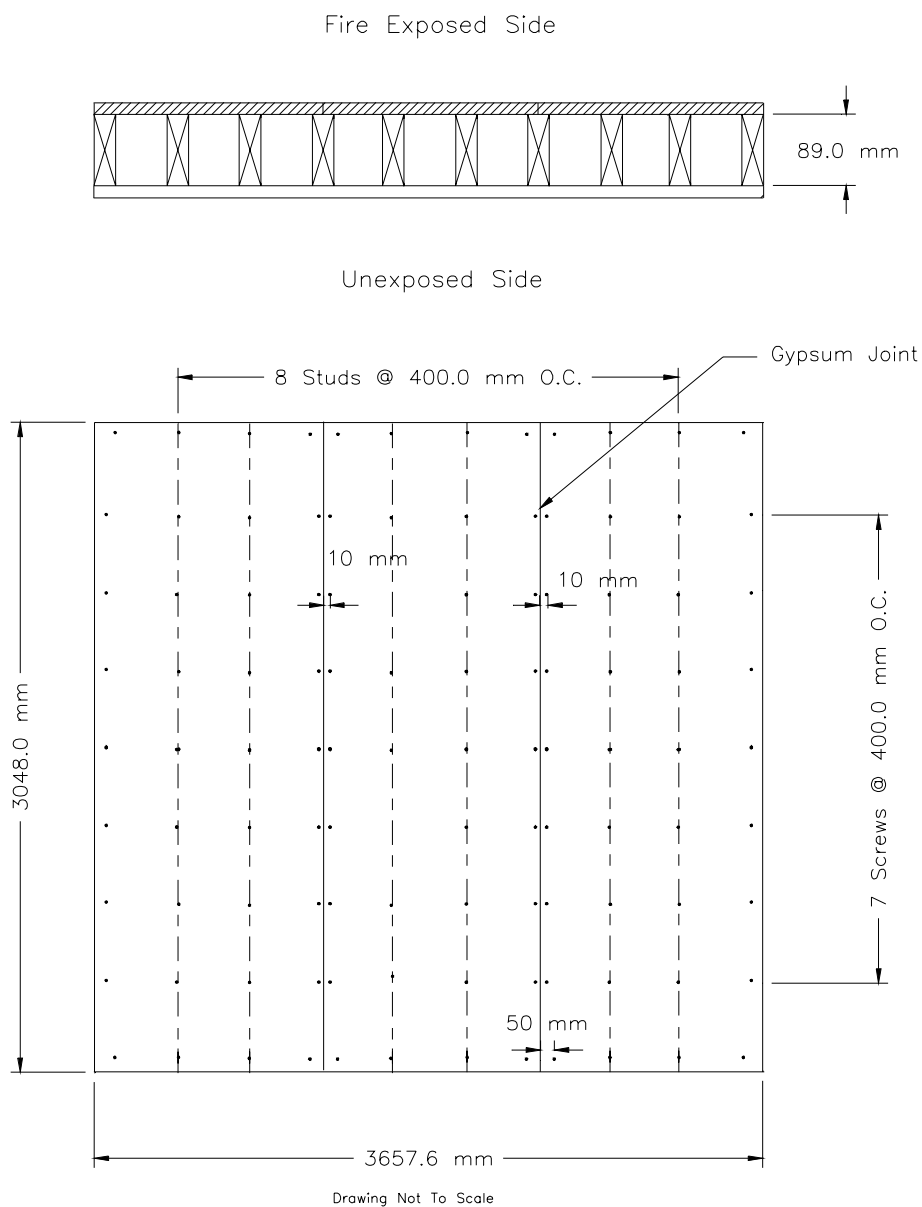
Screw Locations For Wood Stud, 1x1 Gypsum Board Layers, Full-Scale assembly (Fire Exposed Side)
